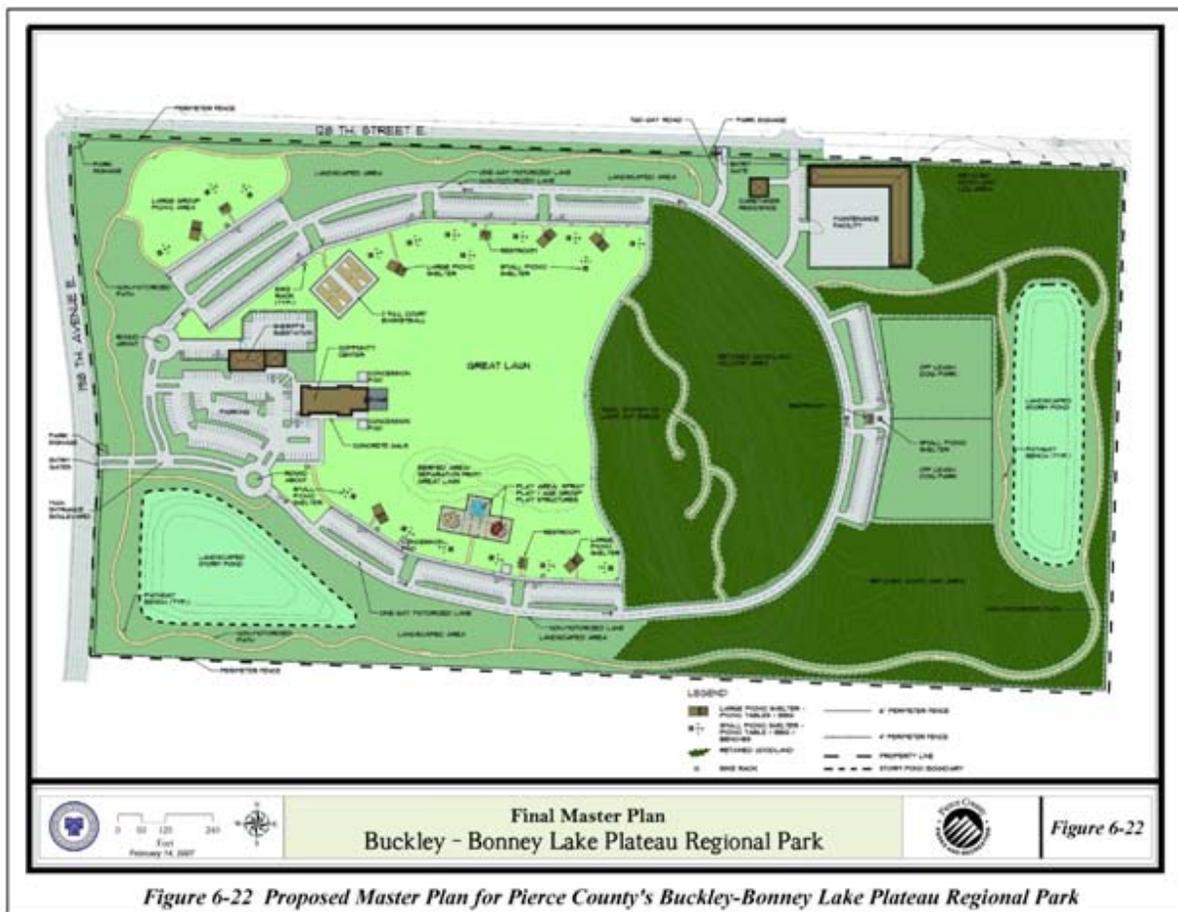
Proposed Master Plan for Pierce County's Buckley-Bonney Lake Plateau Regional Park
